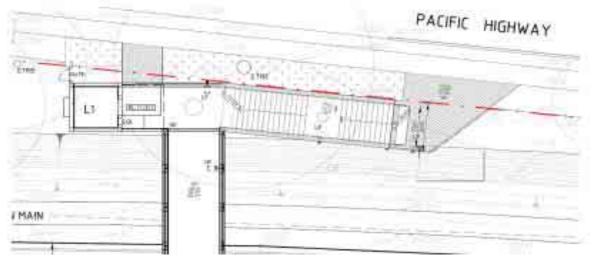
Proposed lift shaft arrangement at footbridge level
